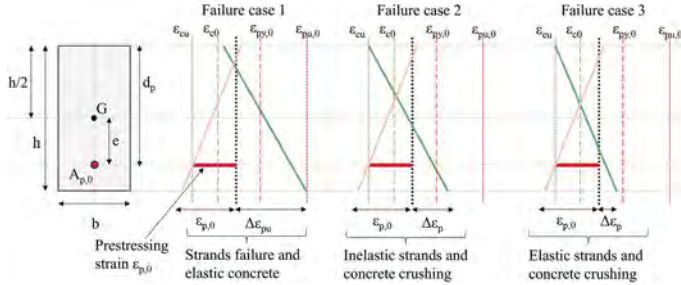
Failure cases for prestressed concrete beam sections.
